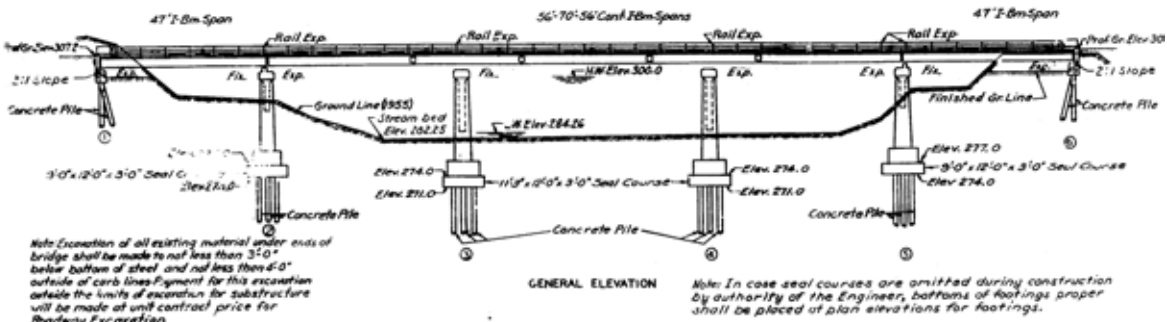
Bridge General Elevation (Old Wahite Ditch Bridge).
